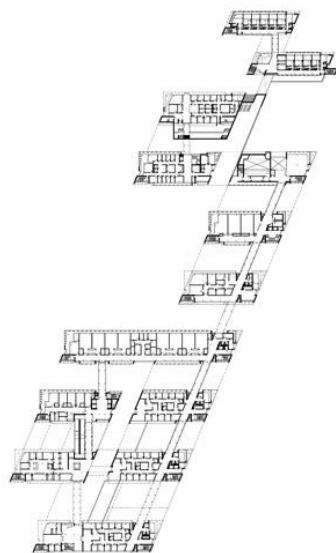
Plan Layout. Source: www.archdaily.com
